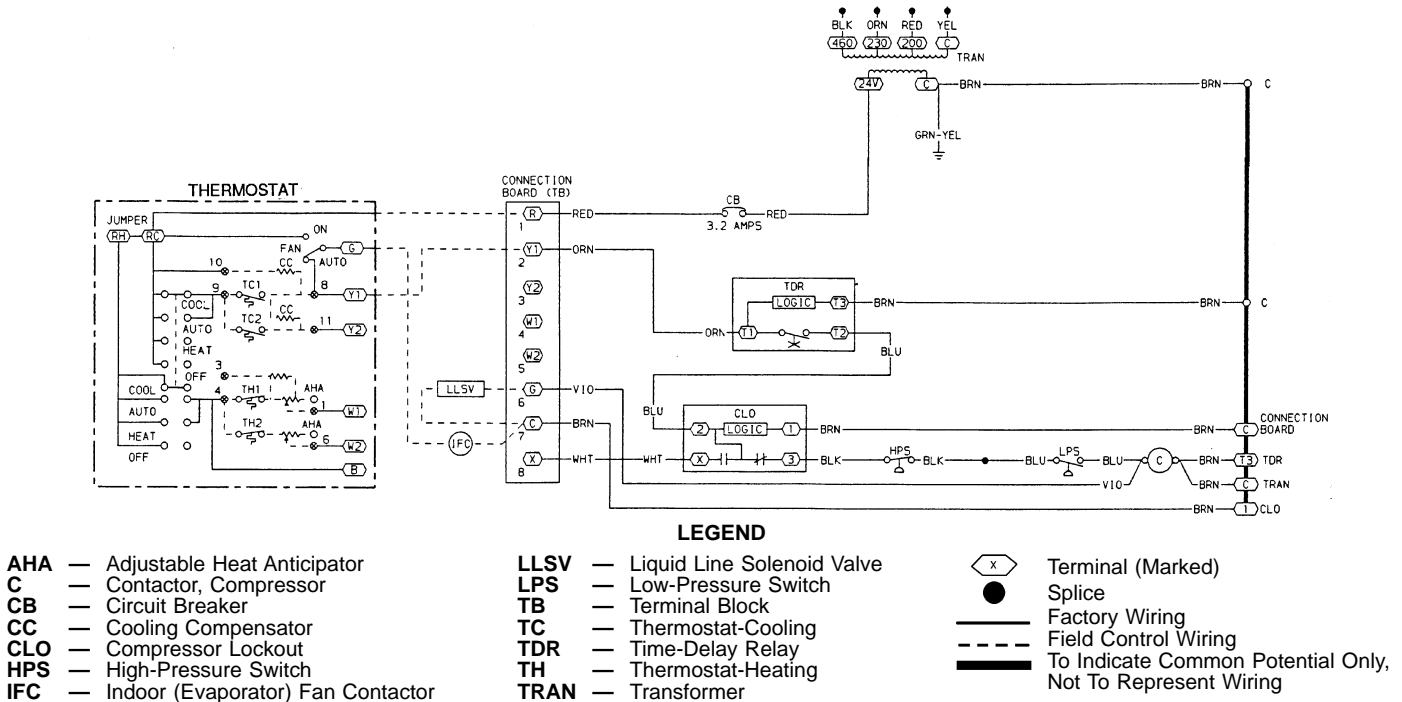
Typical Control Wiring Connections (569C Shown)
